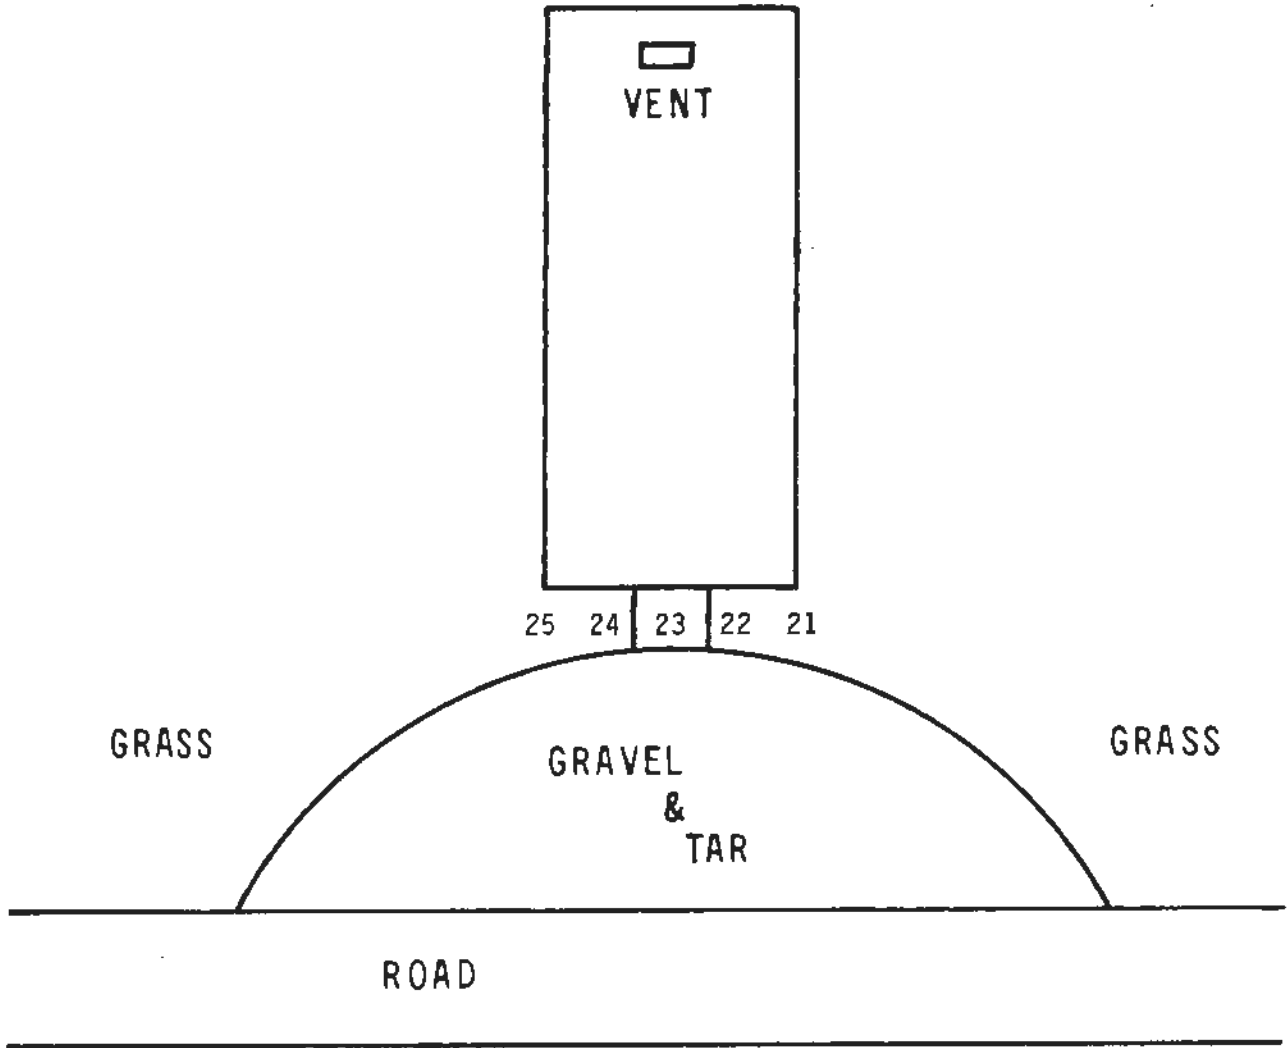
First Team Surveyed Positions: Building 811 (Exterior)
